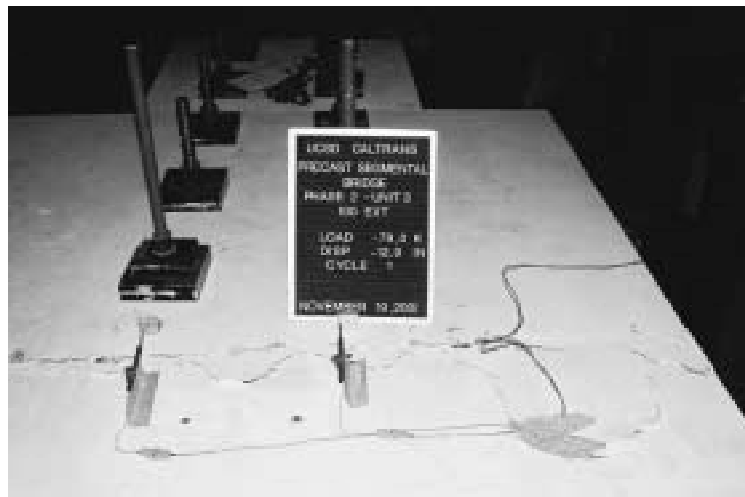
Concrete spalling in the deck in Test Unit 100-EXT
